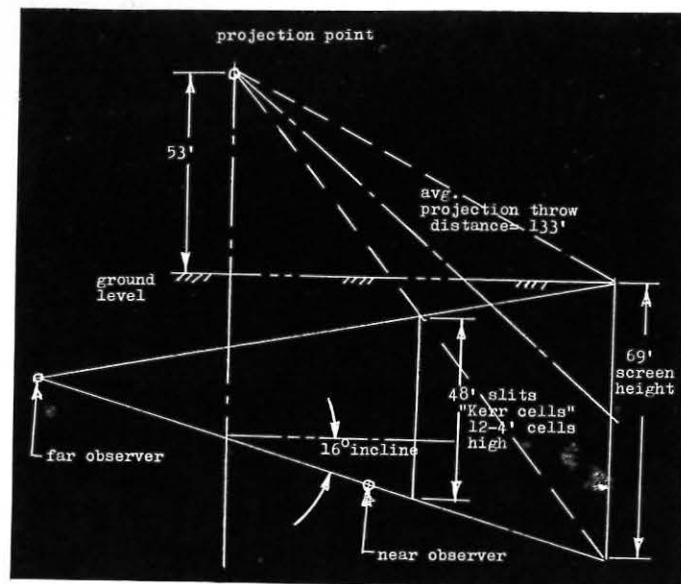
Stereoscopic theatre scale layout (elevation view)
